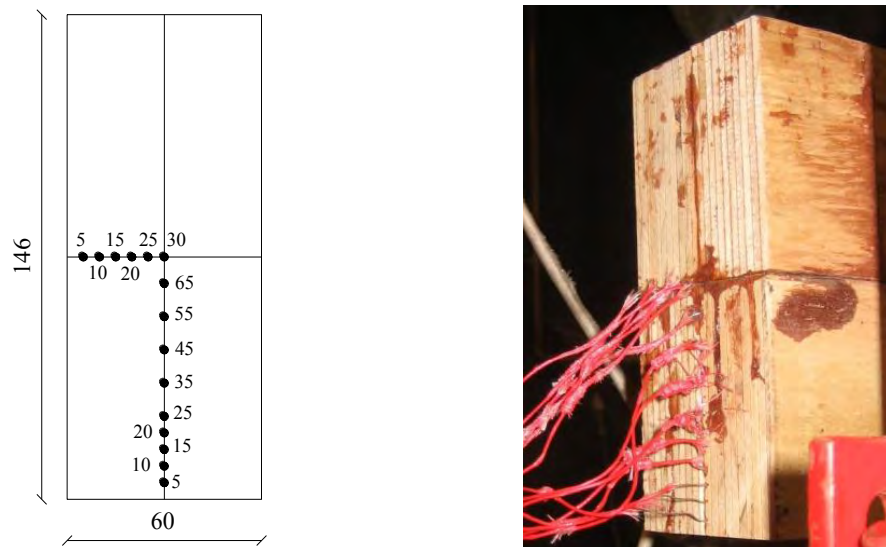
Thermocouple layout with dimensions in mm (left) and instrumented specimen cross-section (right).
